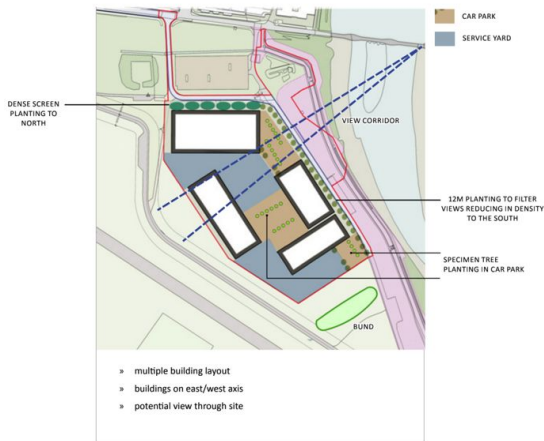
Diagram - Multiple Building Layout - Four Buildings
